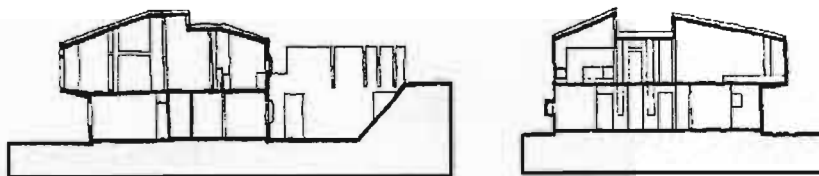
P.Mikula – House Lazarus and House Marian (1965). Sections.
